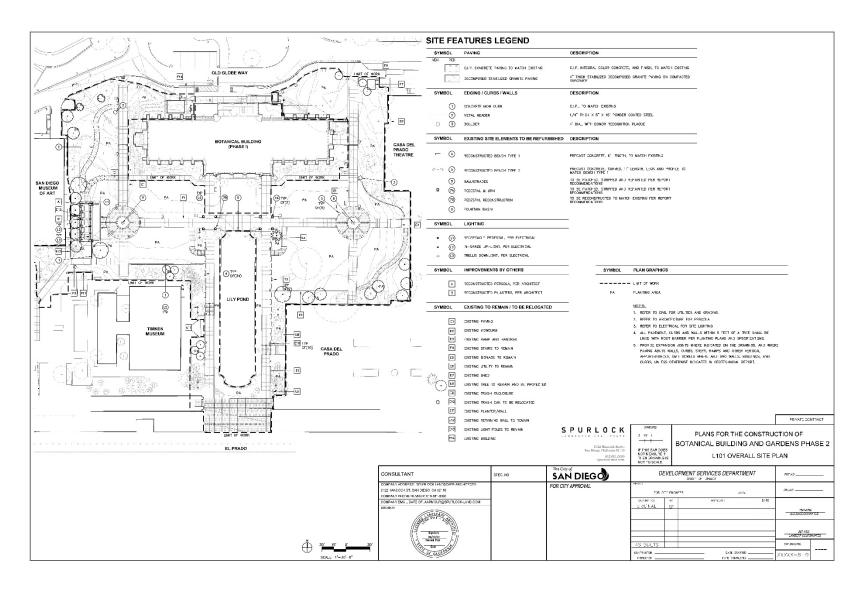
Proposed Site Plan. Courtesy of Spurlock Landscape Architects.
